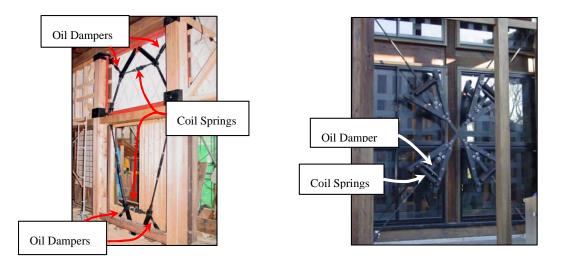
Tensile toggle damper system installed Fig. 4 Umbrella Shaped Damper System installed in Japanese traditional timber structure
